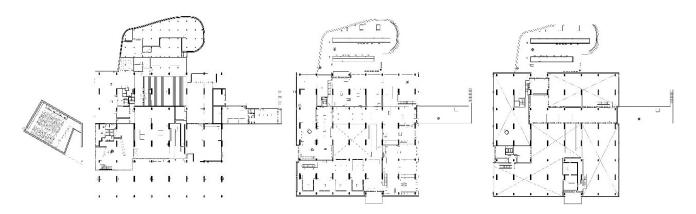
Floor Plans of Government Museum and Art Gallery, Chandigarh. (L) Ground floor plan, (C) First Floor Plan, (R) Second Floor Plan. Source: DRONAH
